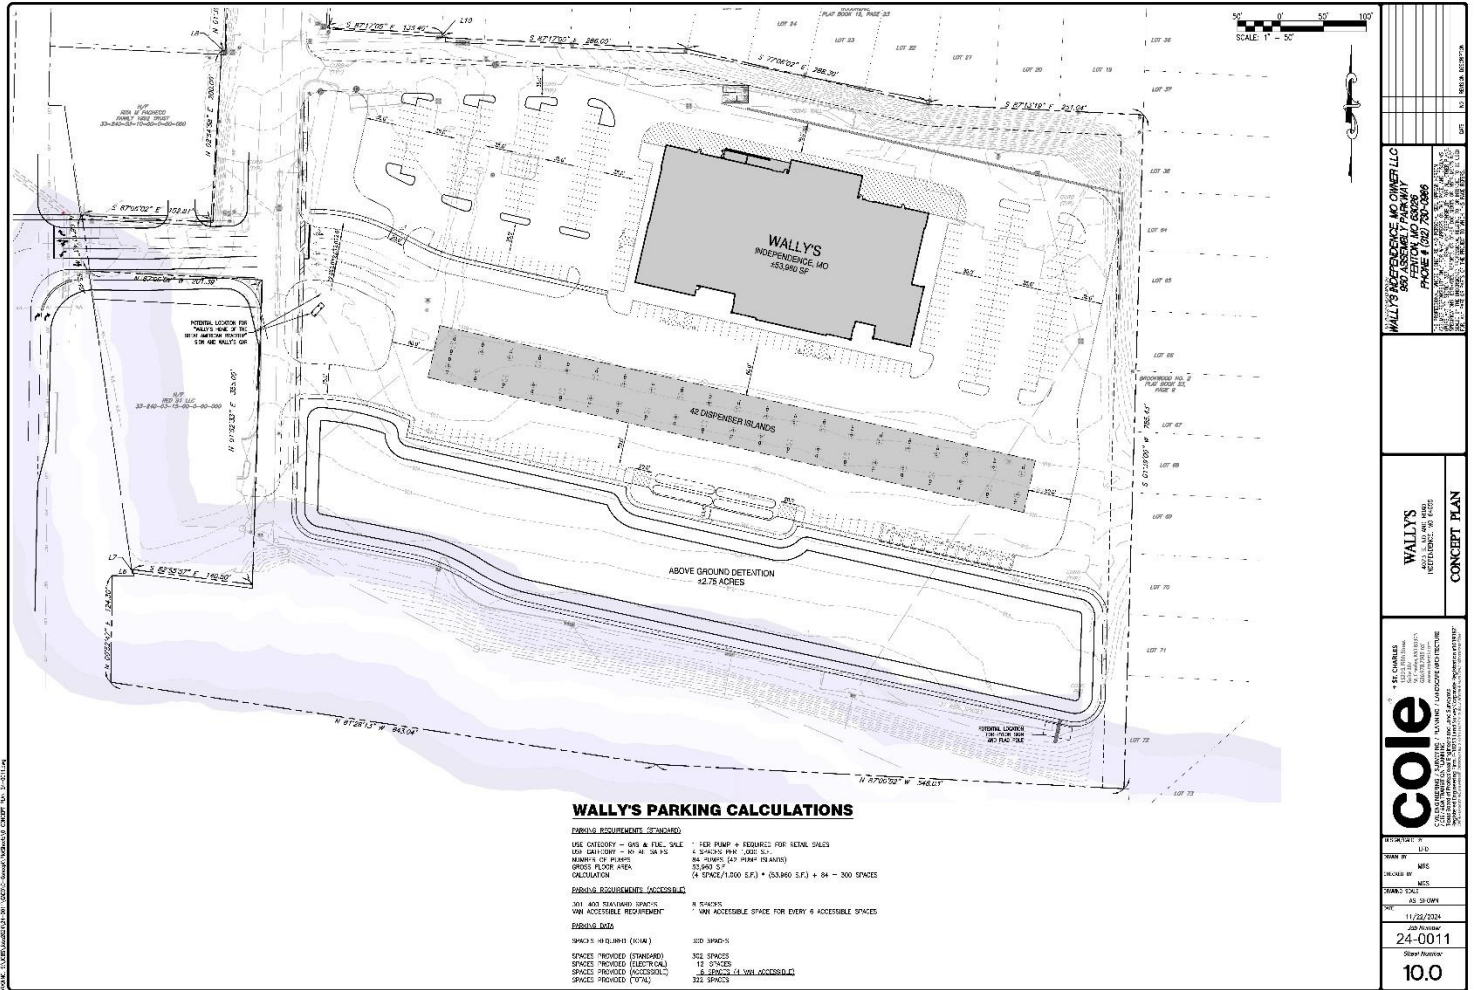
TO WALLY'S TAX INCREMENT FINANCING PLAN
